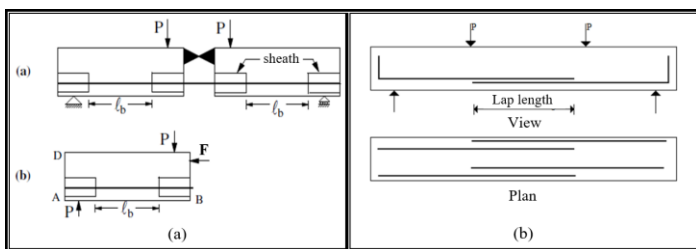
The beam test setups: a) Standard Belgium Hinged Beam test setup, b) Beam Cracking test setup (Tuğrul Tunç, 2020).
